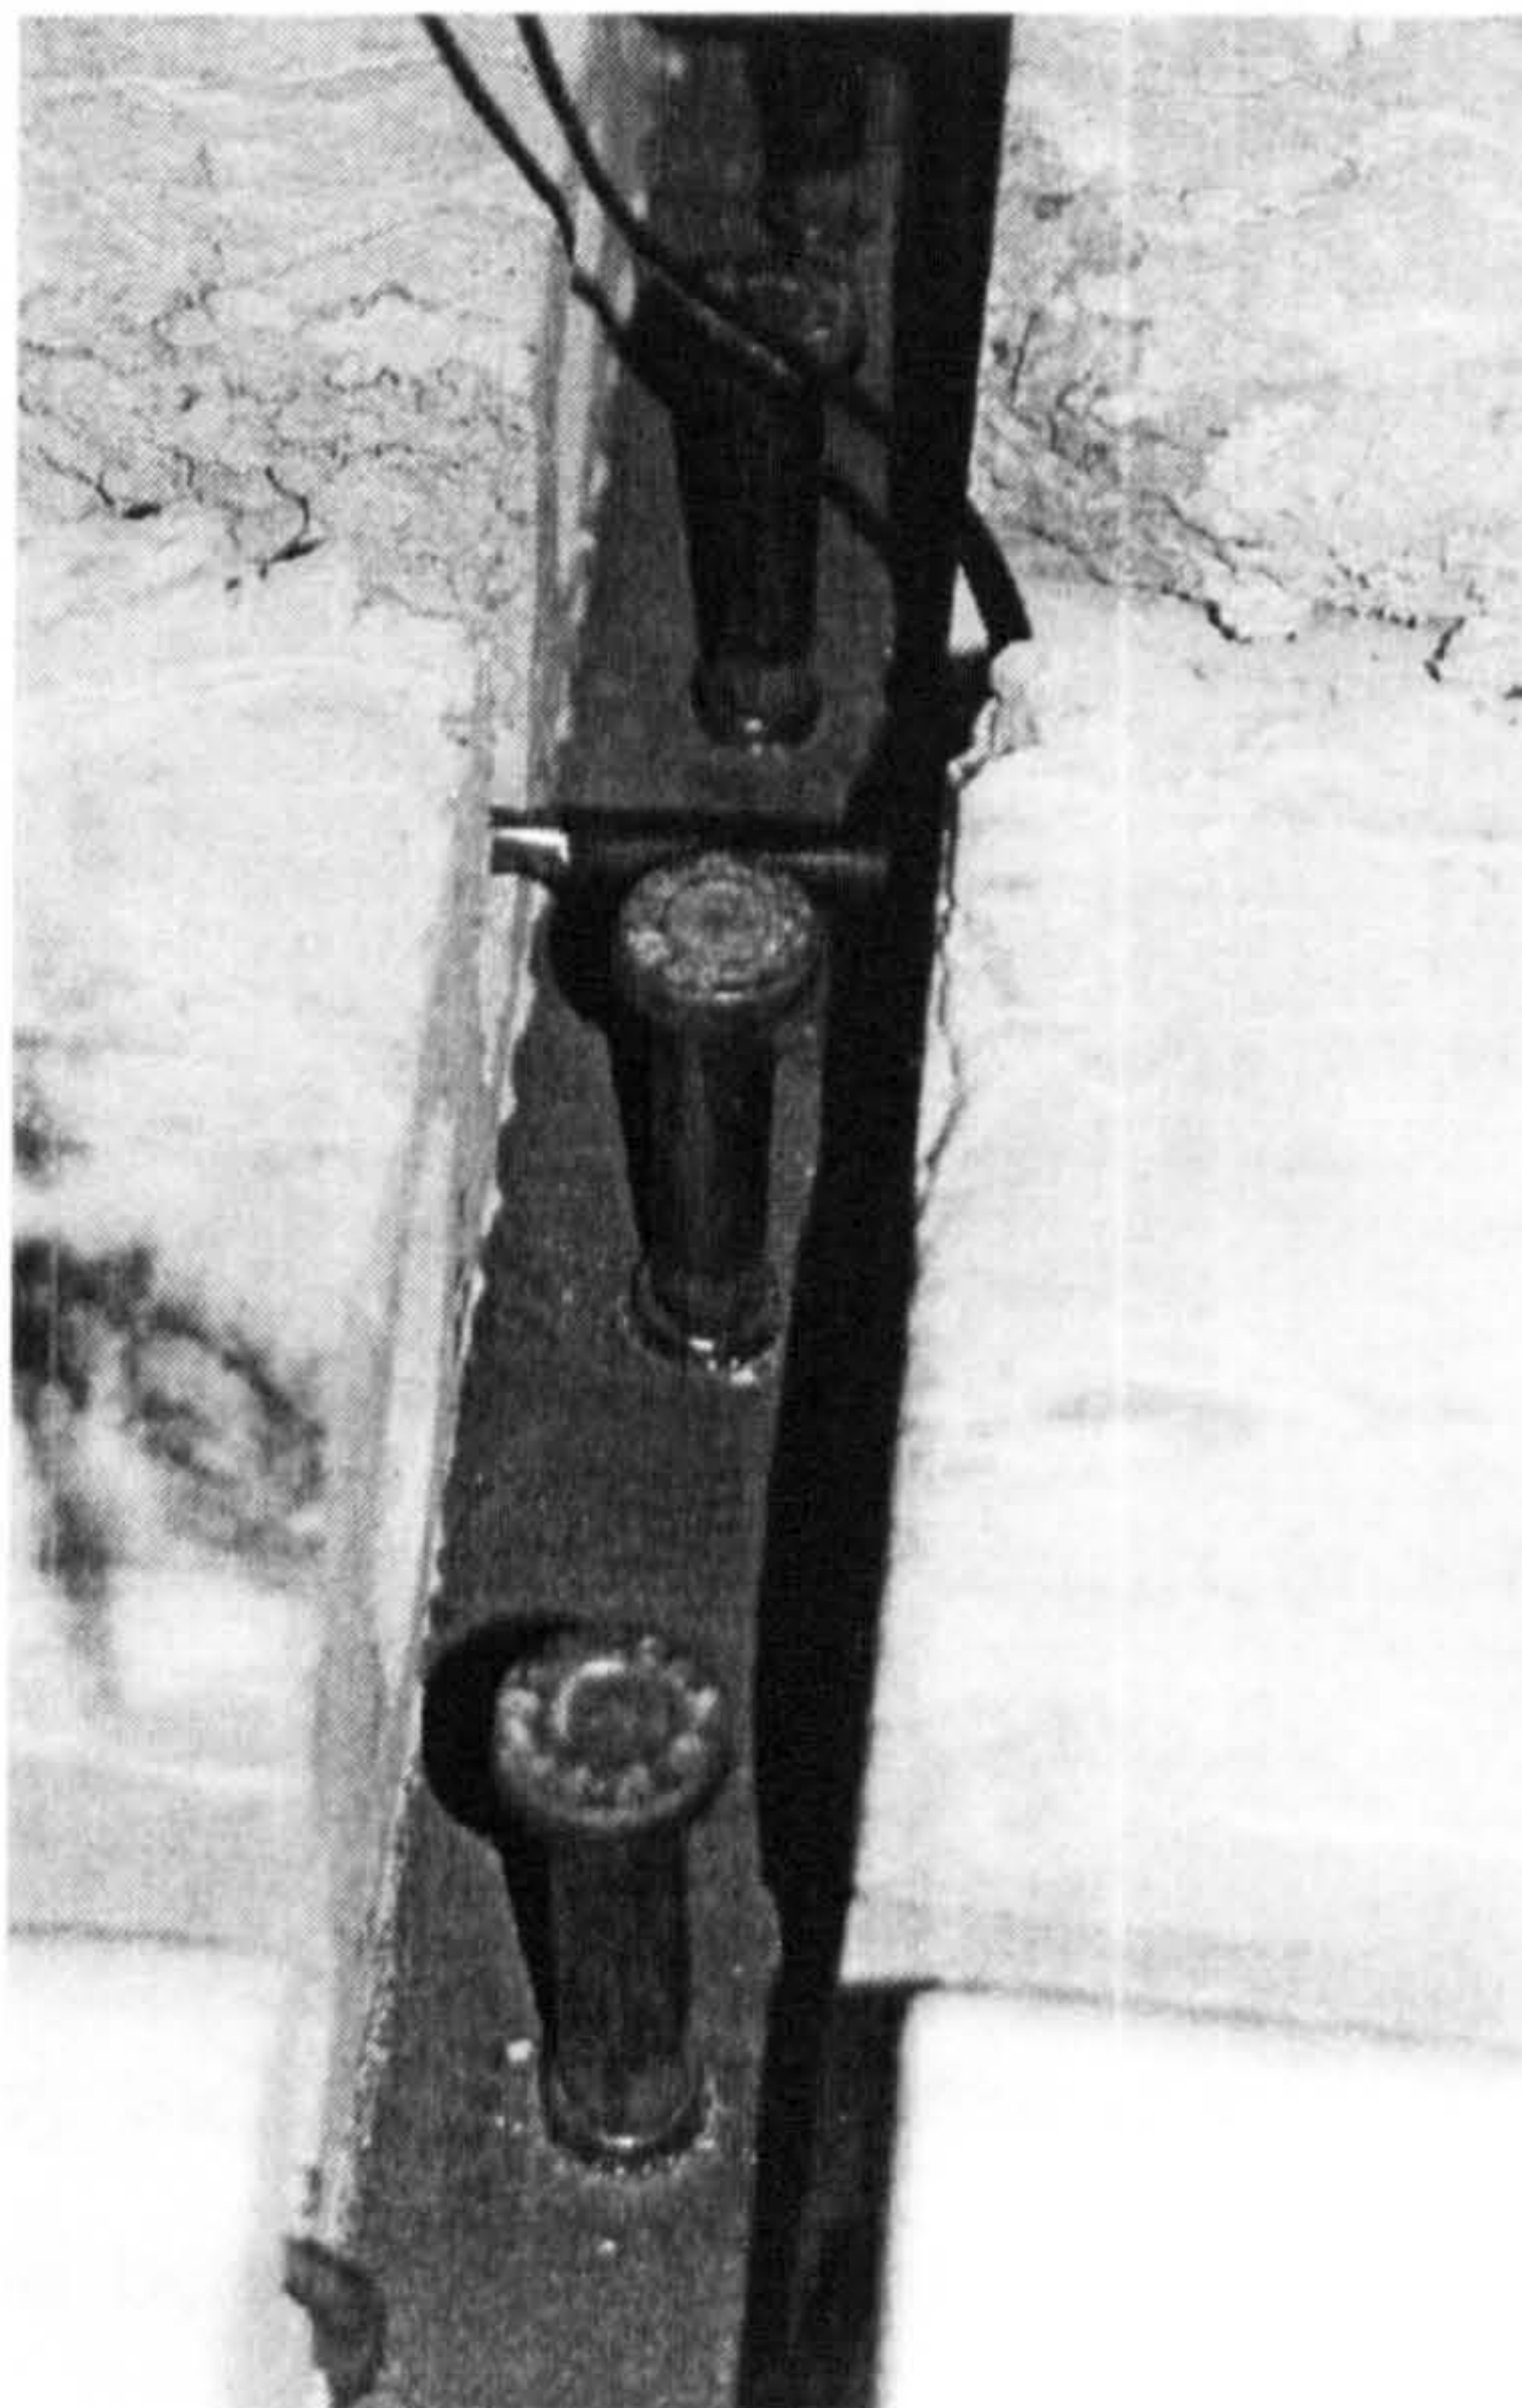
Details of headed studs and reinforcement bars within the gap
